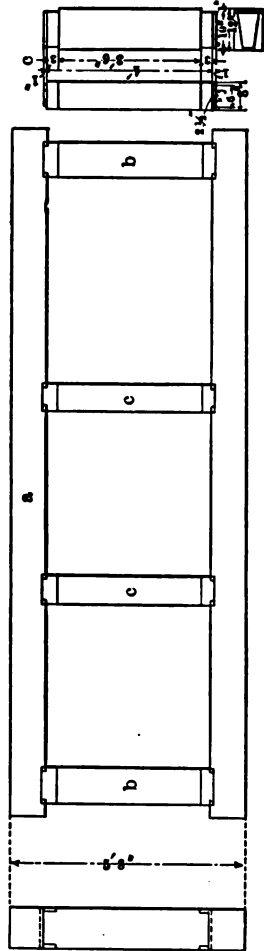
THREE-COMPARTMENT SHAFT SET.
